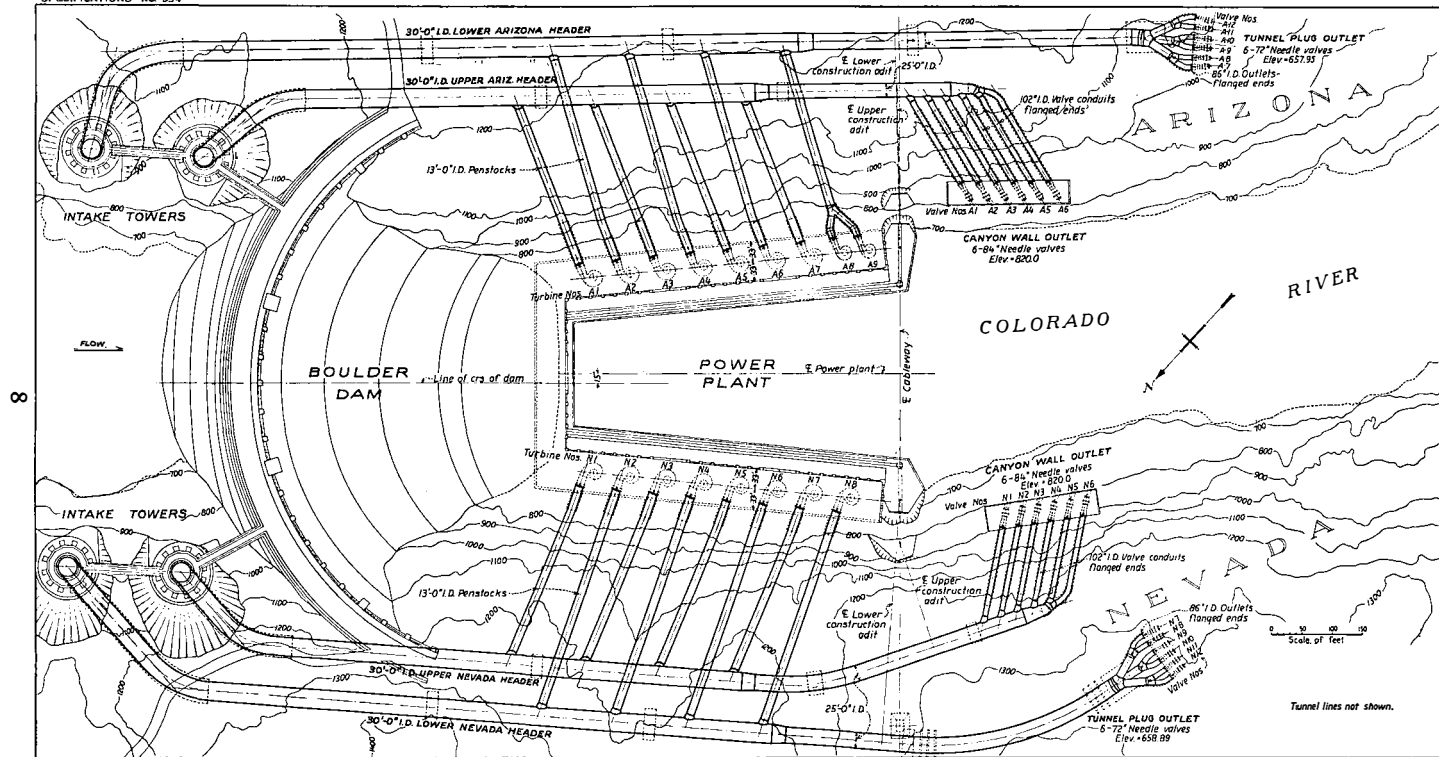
BOULDER DAM PLATE-STEEL OUTLET PIPES—PRELIMINARY LAYOUT
